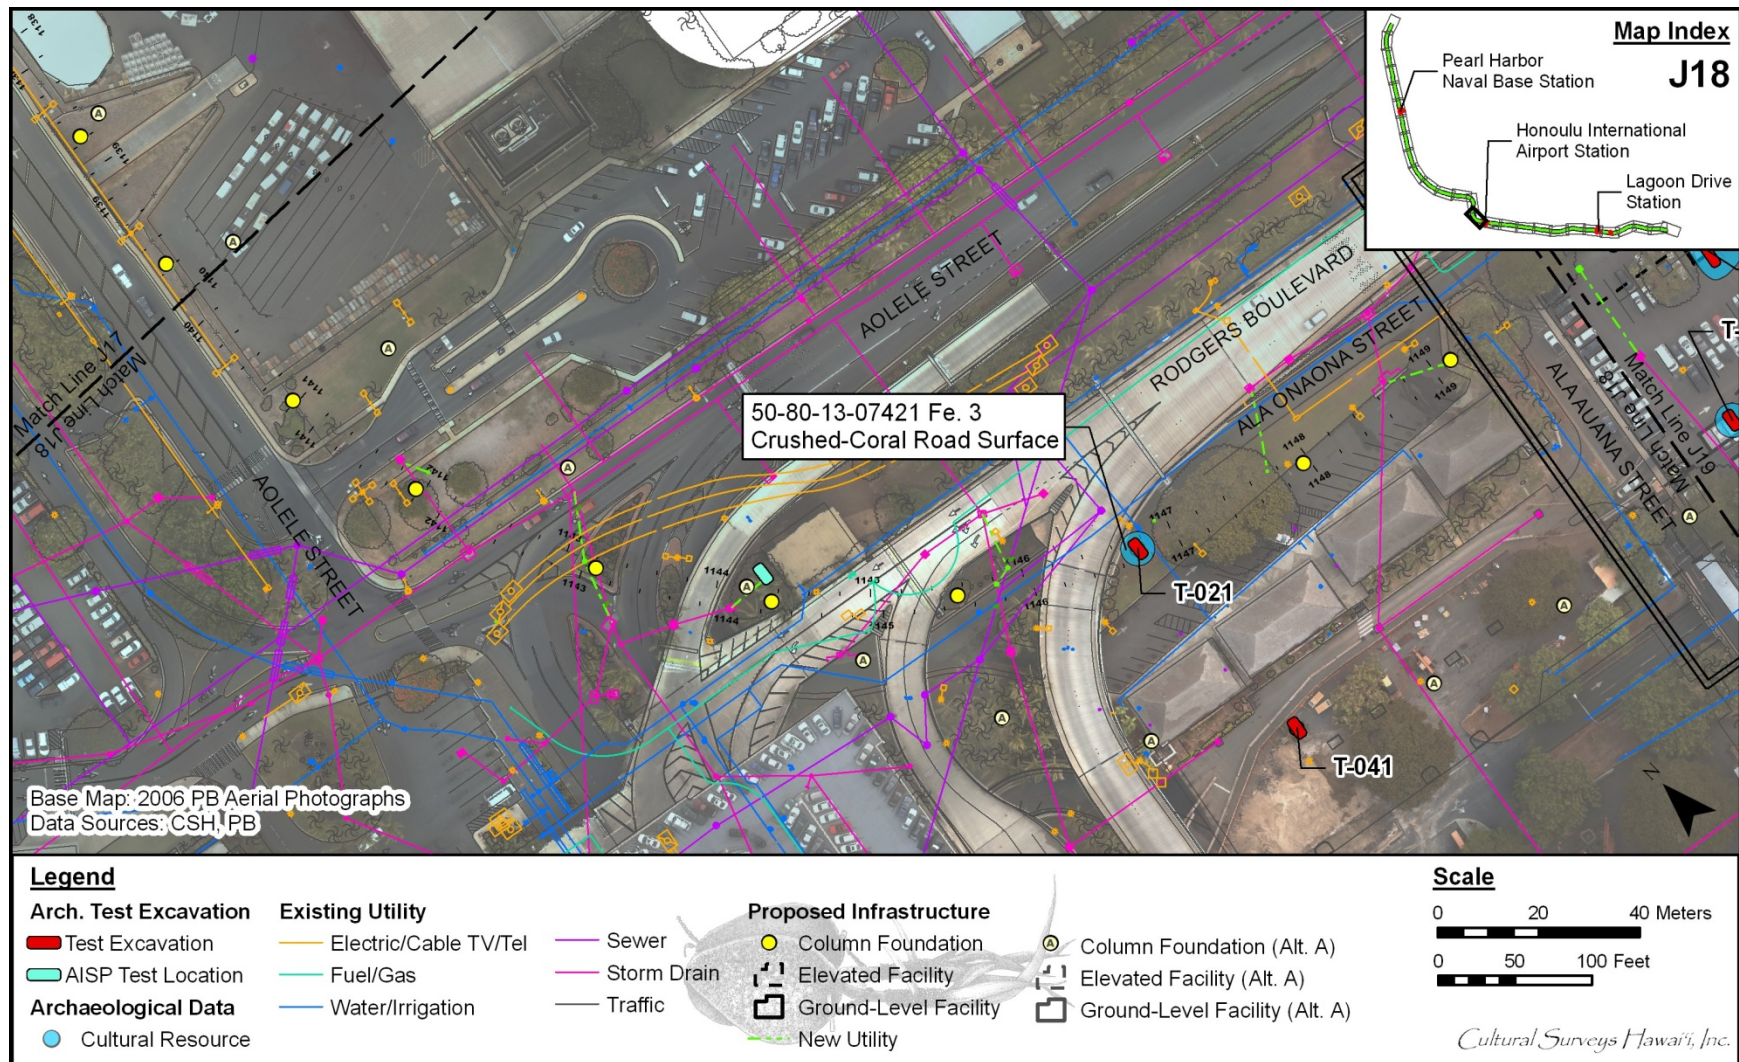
Map Sheet J18, two test excavations (T-021 and T-041) at column foundation @ 1134+30
